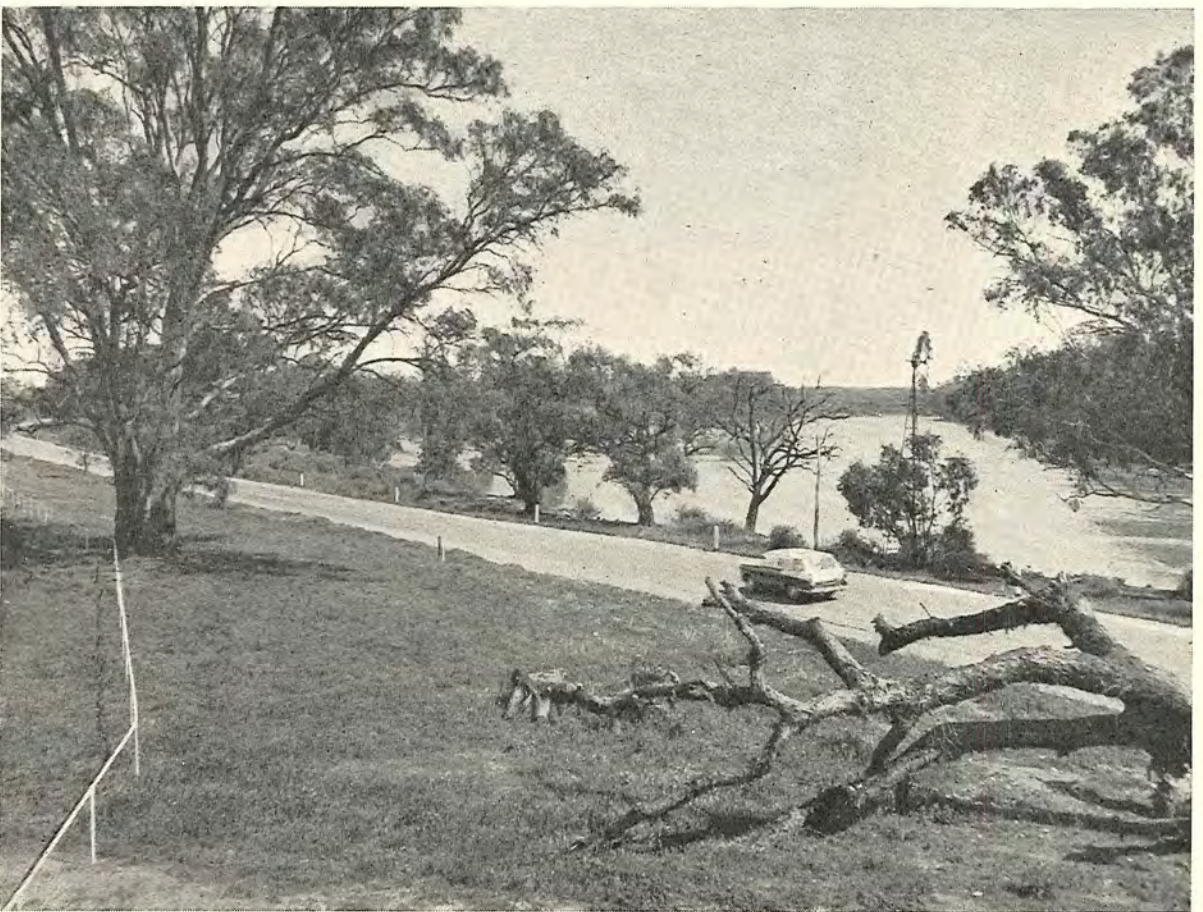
Reconstructed section of the Murray Valley Highway near Boundary Bend—Shire of Swan Hill.
